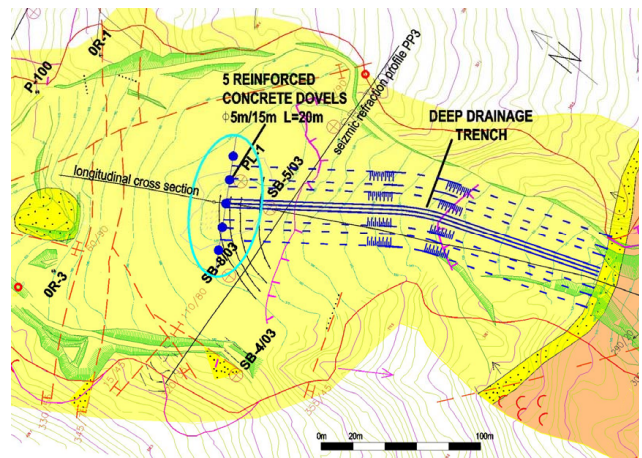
Plan view of the upper part of the Slano Blato landslide with 5 reinforcing and dewatering shafts-dowels and deep drainage trenches.
